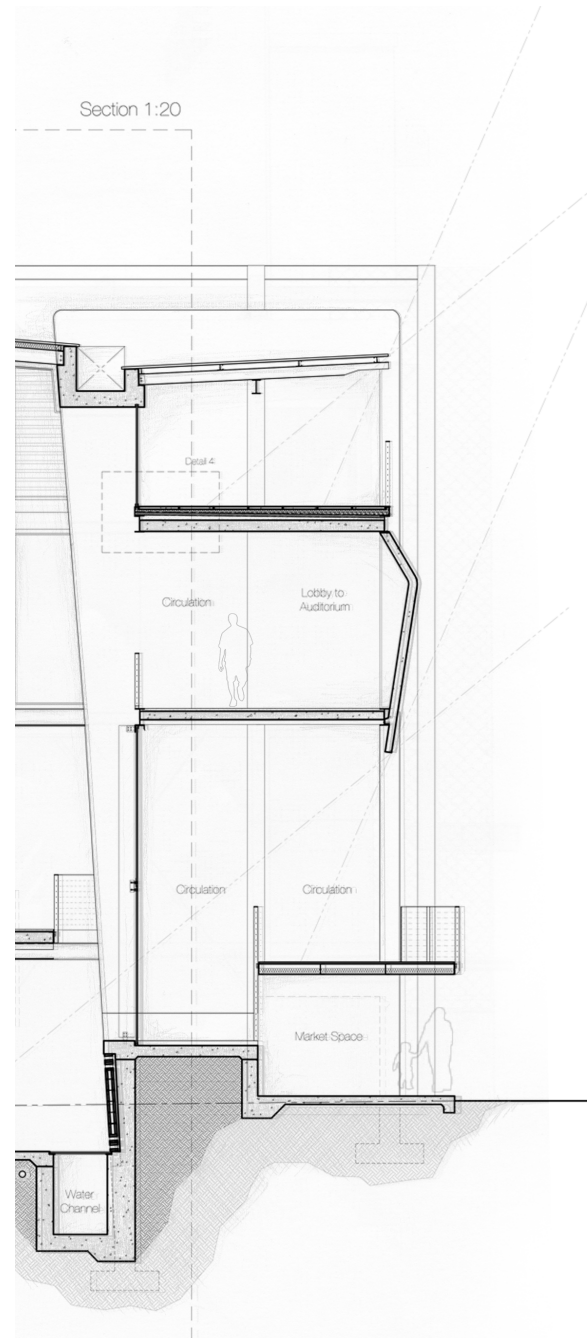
Section of the external facade on Stanza Bopape Street illustrating the circulation as facade activity from ground floor extending throughout the building (Author 2015)
